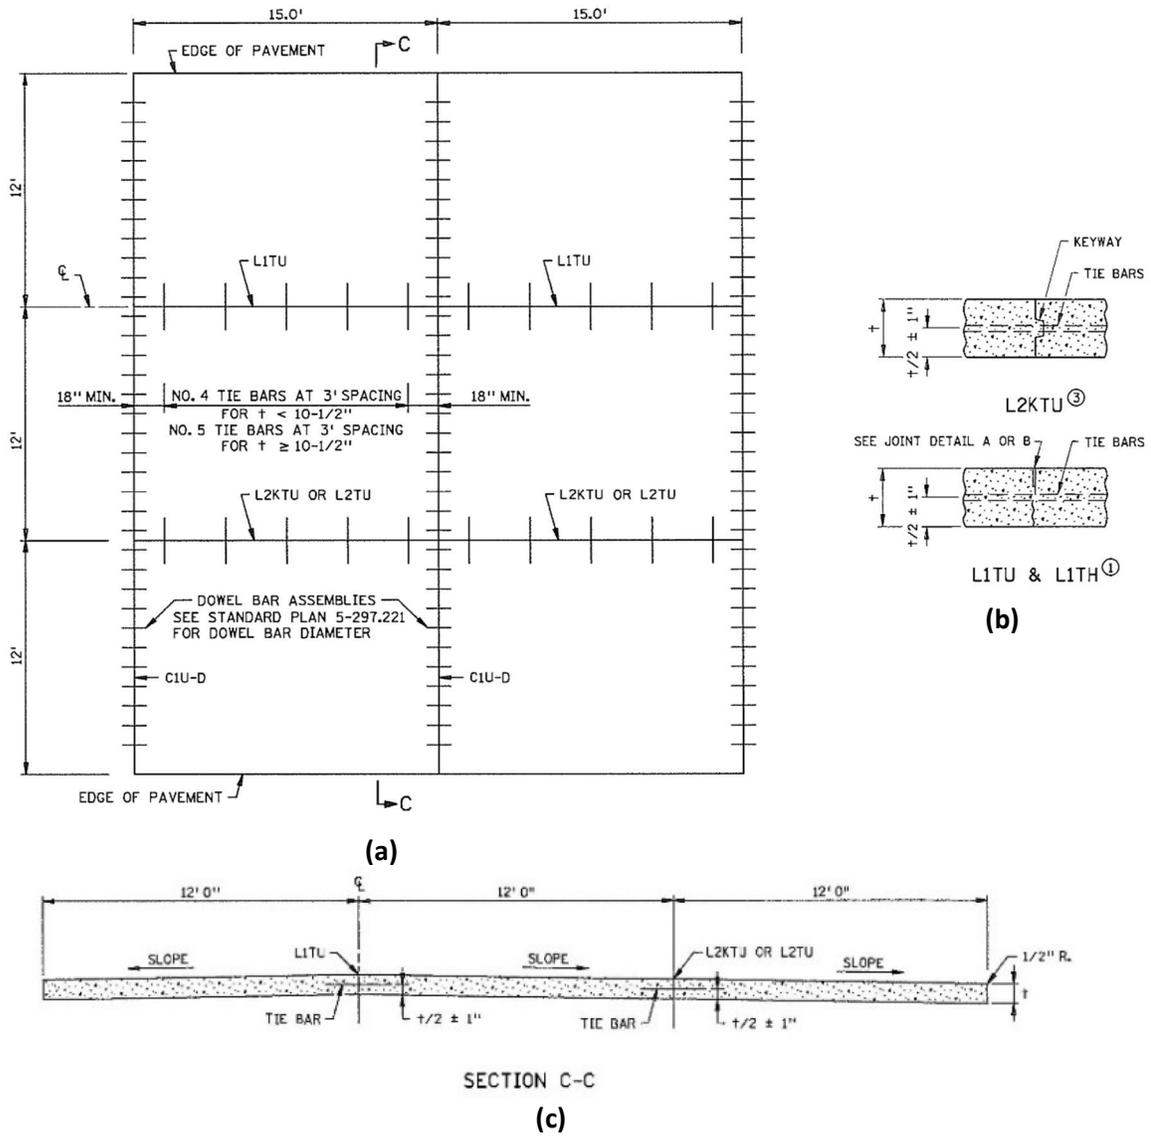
Typical concrete panels. (a) configuration of the panels, transverse, and longitudinal joints, (b) details of longitudinal joints, and (c) typical cross section of the panels.
